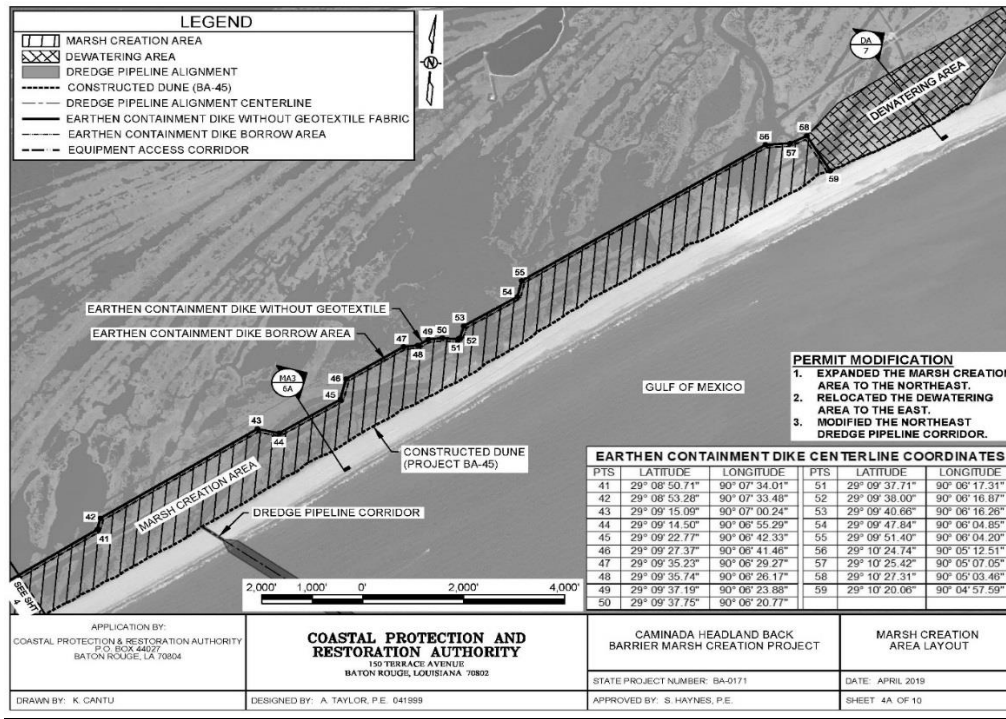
Plan view of the BA-171-2 earthen containment dikes (in the BA-193 project footprint)
